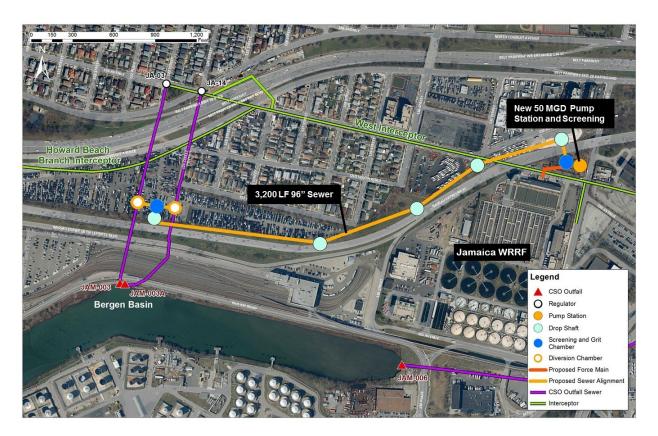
Layout of Proposed Parallel Sewer to West Interceptor and Dewatering Pumping Station
